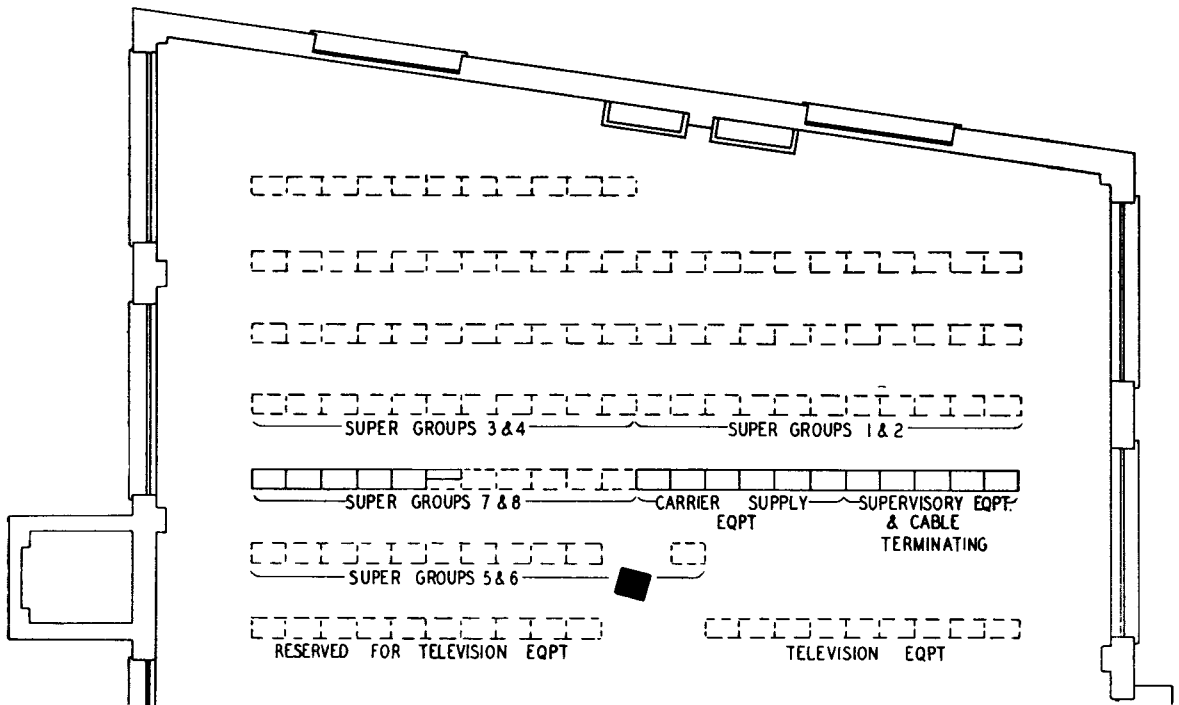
RACK LAYOUT, BIRMINGHAM TERMINAL STATION.
